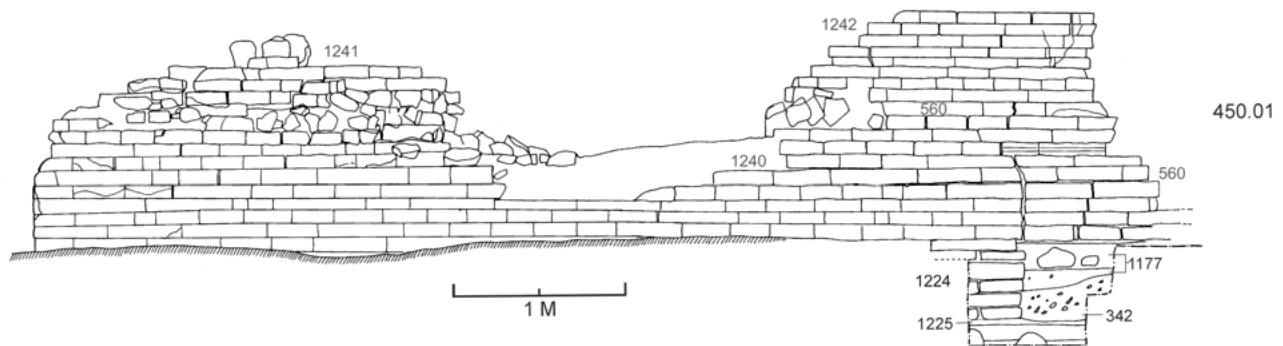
Elevation of the southern face of the southern wall of the South Temple (wall 560).
